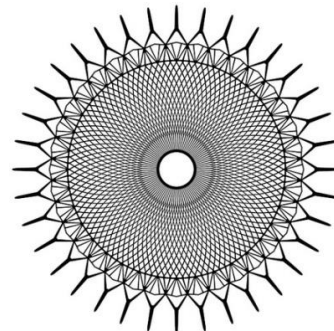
Constructions of coatings with prefabricated reinforced cement corrugated elements eng. PL Nervi, Italy
